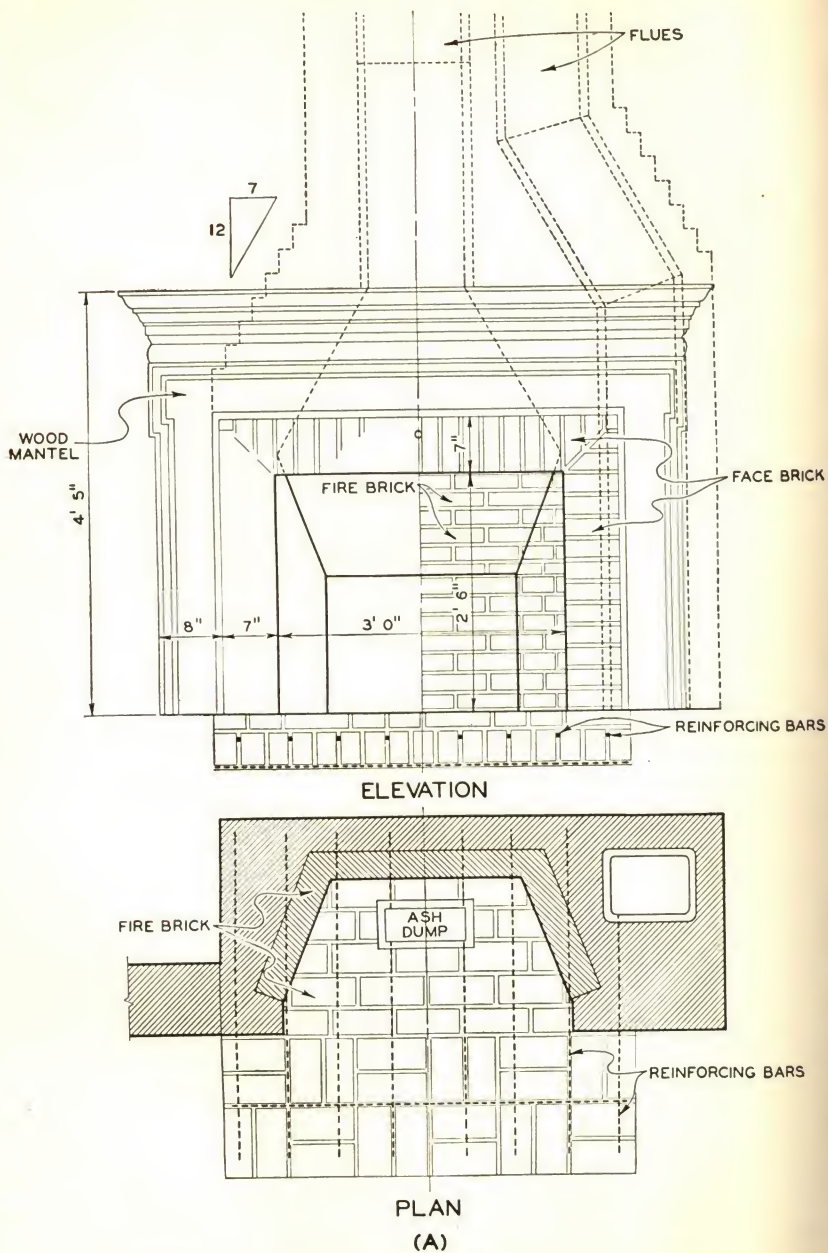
A. Plan and Elevation of Fireplace and Chimney Details
